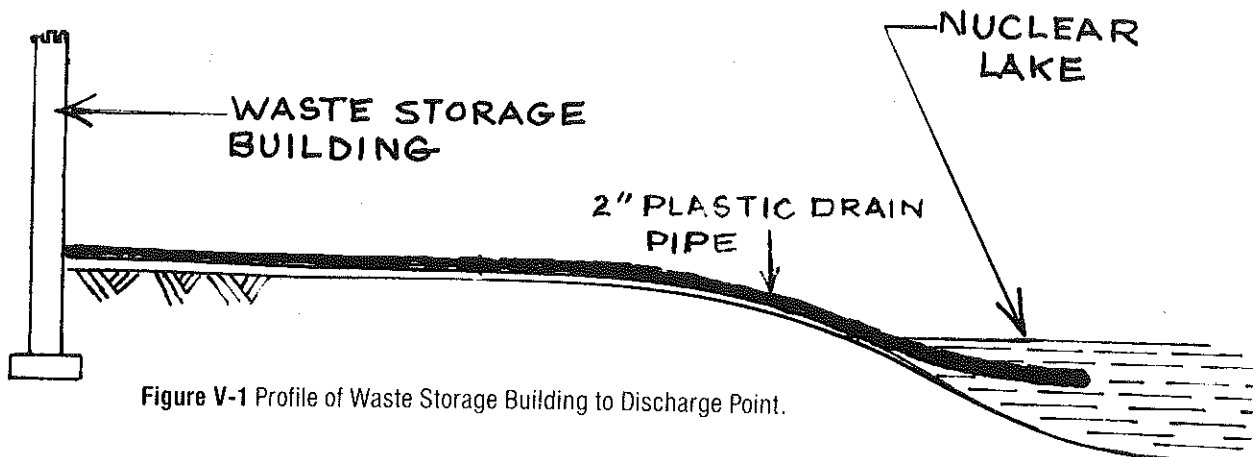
Profile of Waste Storage Building to Discharge Point.
